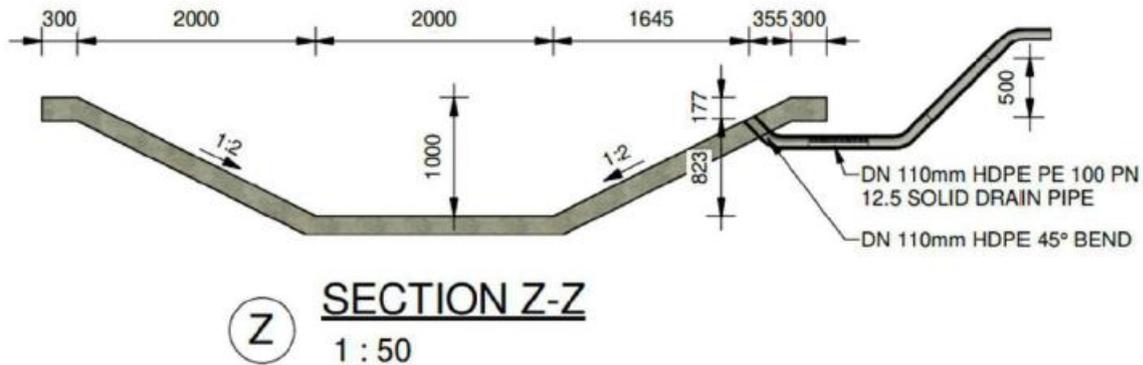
Typical Trapezoidal Concrete-lined Channel Detail (Eco Elementum, 2025)
